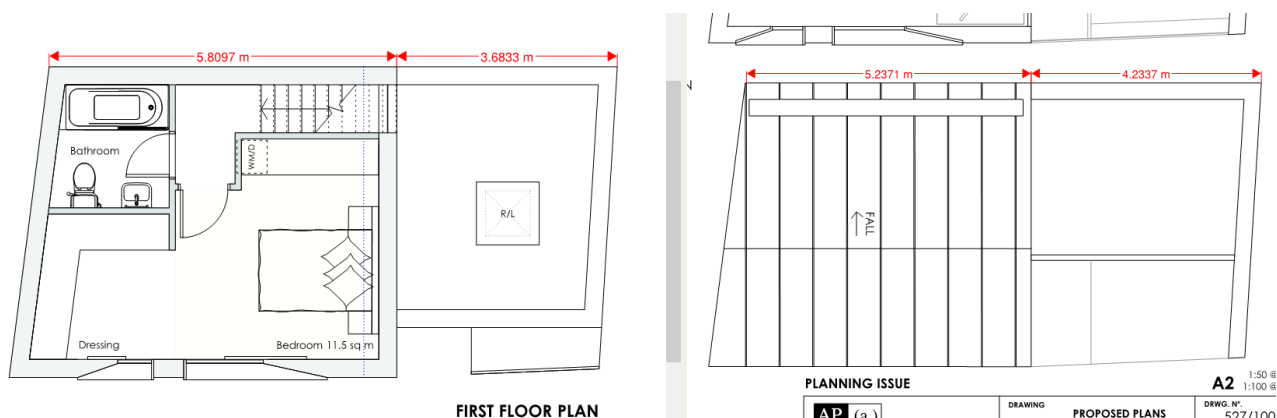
Proposed floor plan (left) – Approved roof plan 2015/2171/P (right) (Note: 0.56m wider two storey element now proposed)
